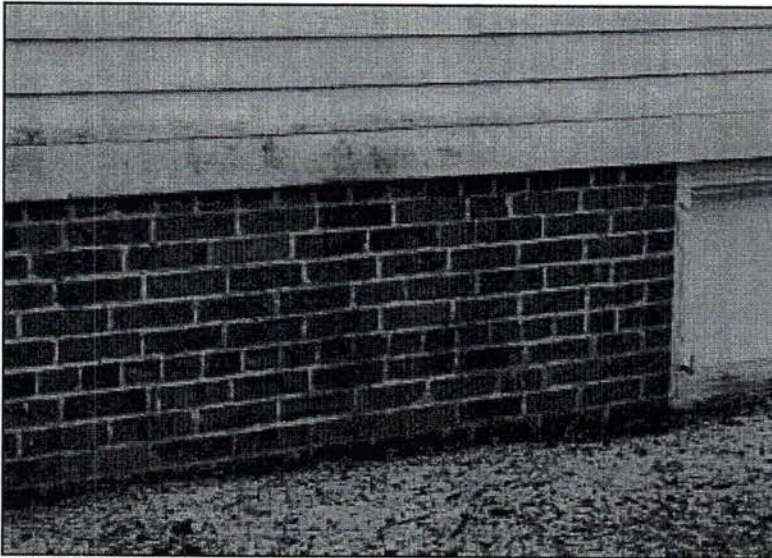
The foundation is constructed of rubble stone to grade with brick laid in a common bond above. Biological growth can be seen at the foundation and lower clapboards of the northern elevation of the main section of the house.
